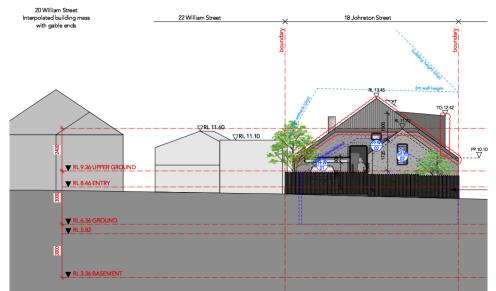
Front elevation of new dwelling (COSO Architecture, March 2023)
